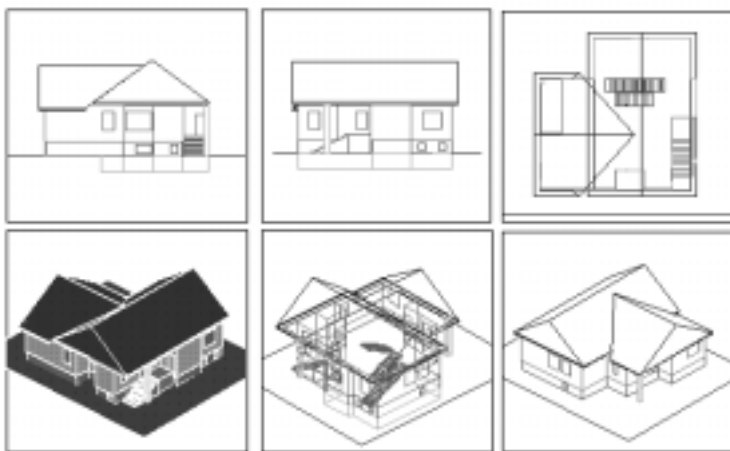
The computer model of the living house, 2 fasades, roof plan
